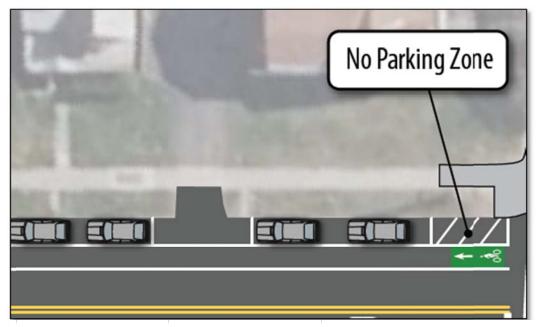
Parking Restriction Hatching Example Source: Alta Planning + Design
